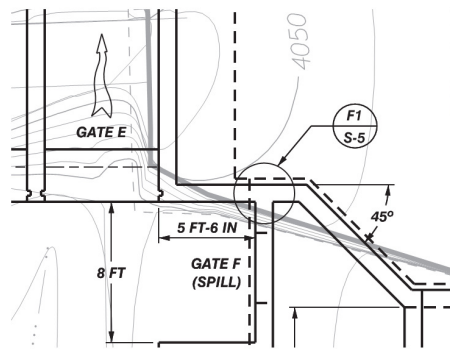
The portion of the principle plan view of a subdivision plat requires a detail view in order to dimension the storm drainage easement.
